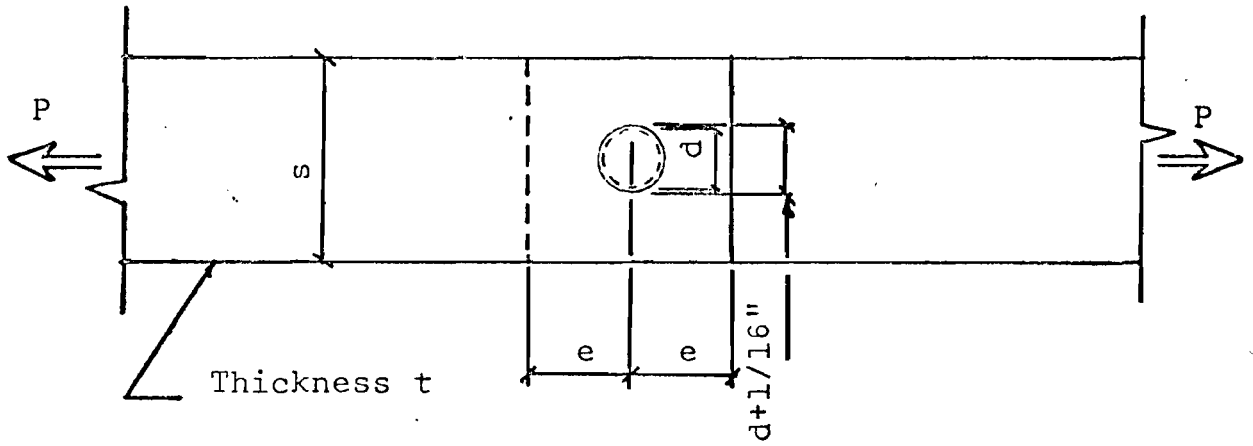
SKETCH OF A SINGLE BOLTED CONNECTION
